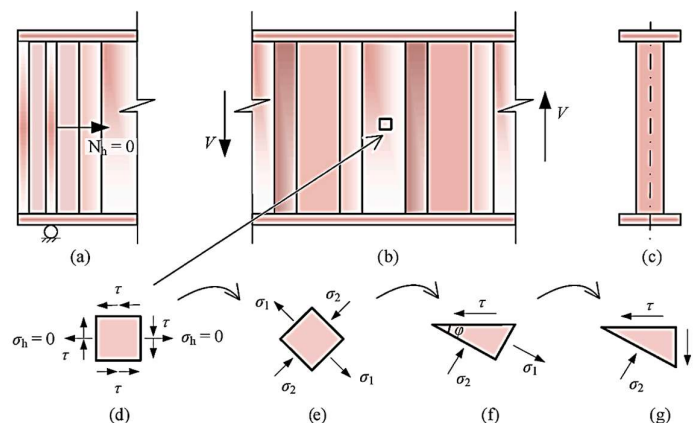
Stress state in the corrugated web of a beam with stiffeners at the ends only, (Zhang et al., 2020).
